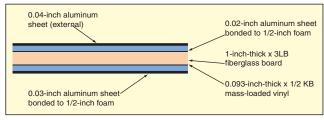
Cross section of low-mass, quiet room modular panel construction.
